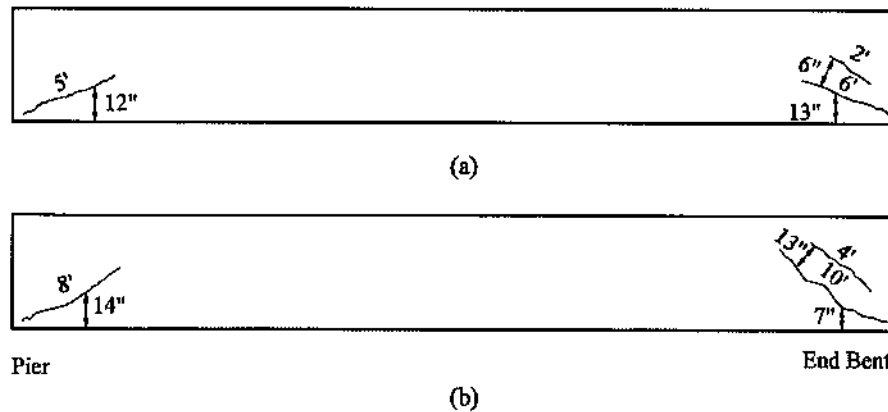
Typical Cracks of Exterior U-beam (Beam 4) Over I-75 South Bound Span, (a) South Web, (b) North Web
